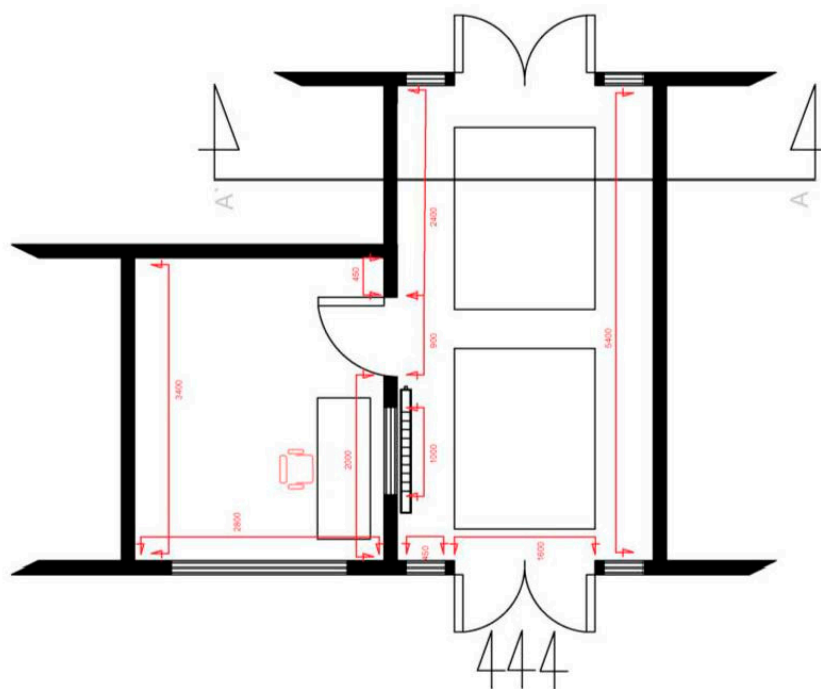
Floor plan of the entrance hall in PK 12-room without green wall.
